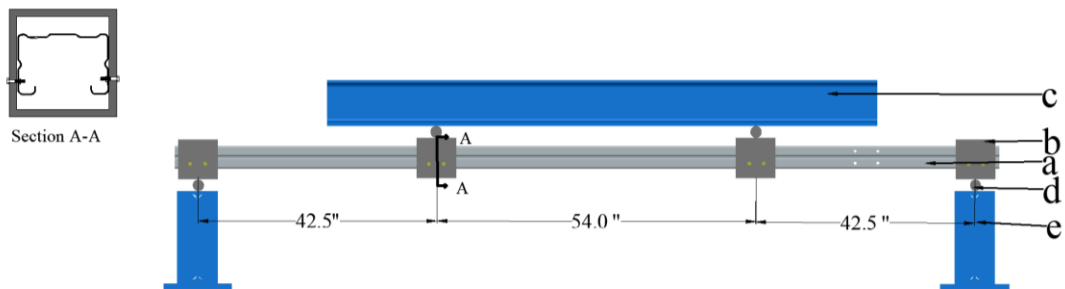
Elevation view of minor axis (LIT) test setup schematic: a. specimen, b. $7 \times 7 \times 1/2$ HSS sections, c. spreader beam, d. rollers, e. end support beam
